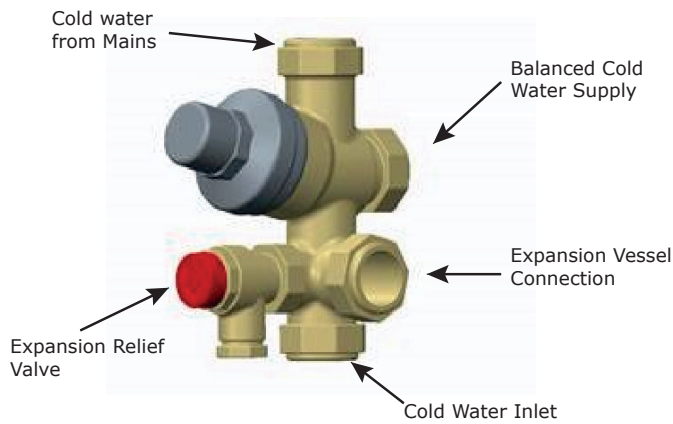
Detail showing the connection of the expansion vessel to the inlet group
